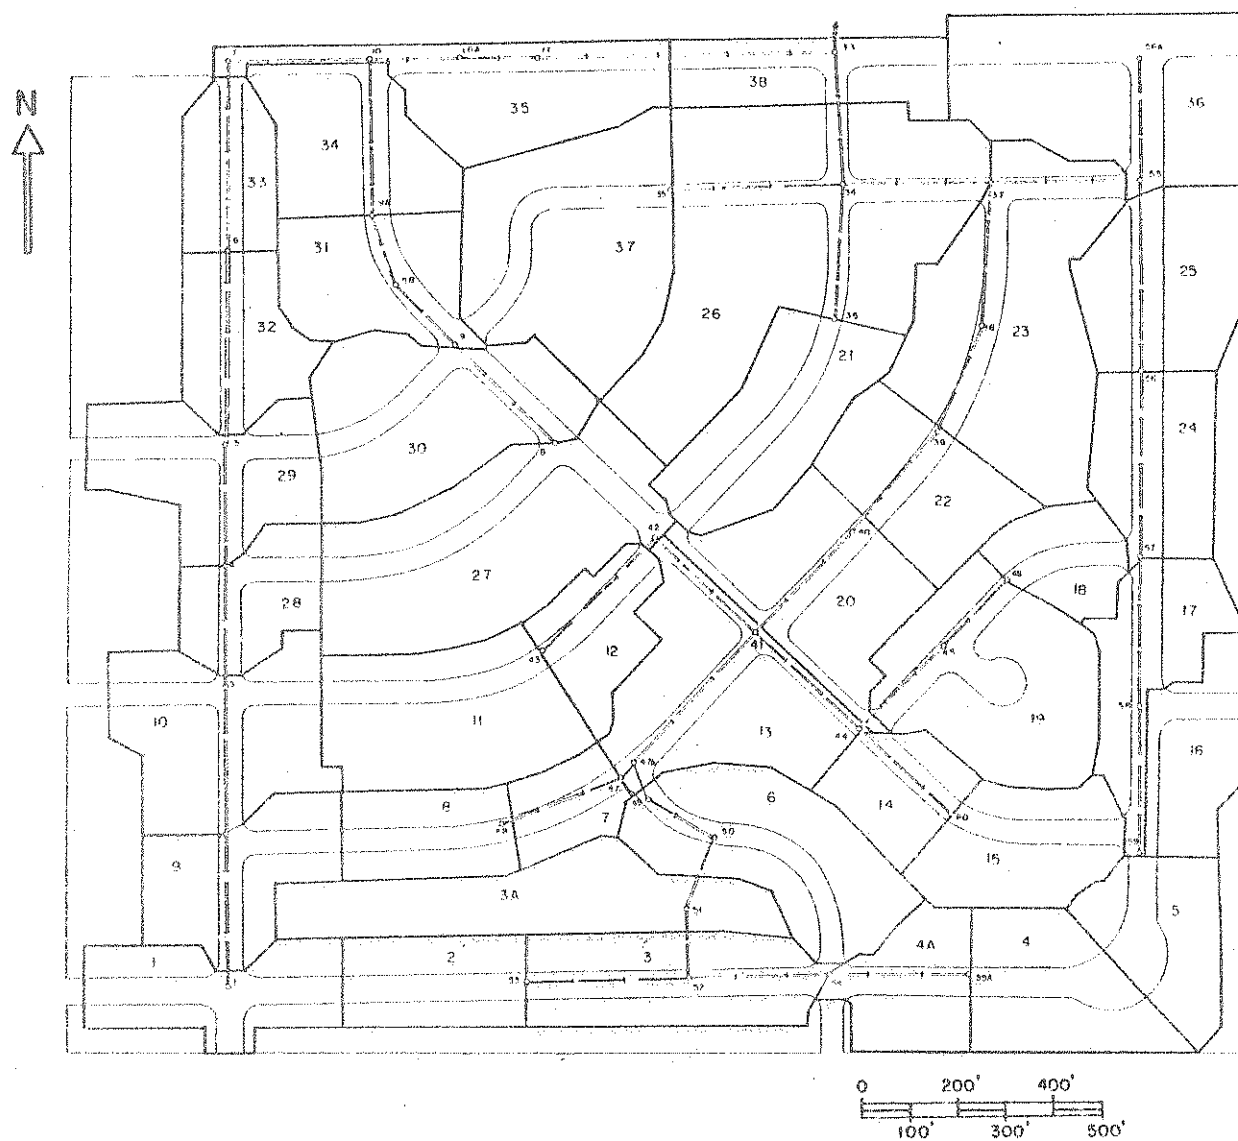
Drainage Subbasins and Storm Sewer Layout of Barry Heights Subdivision (From Burke (1979))
